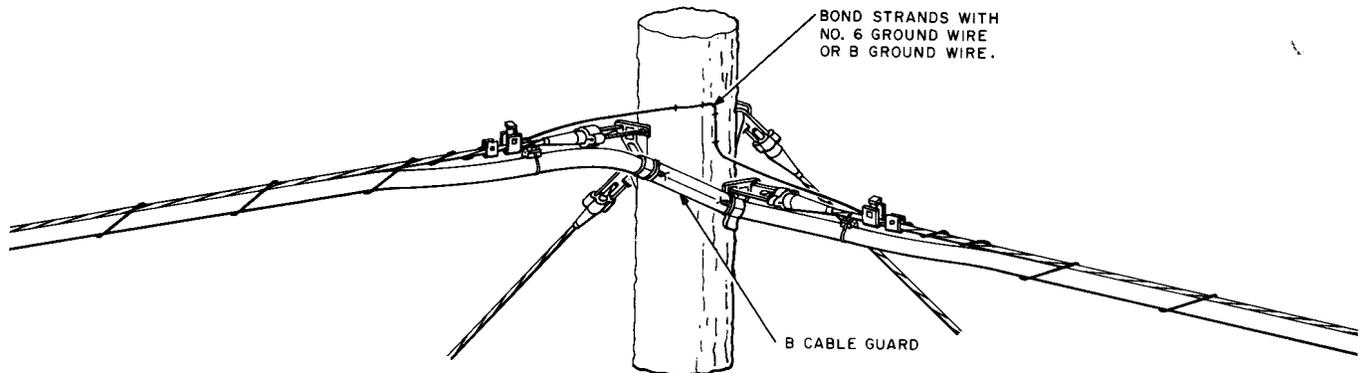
Corner Poles With Pulls Greater Than 10 Feet on 6M or 6.6M Strand and Greater Than 5 Feet on 10M, 16M, and 25M Strand
